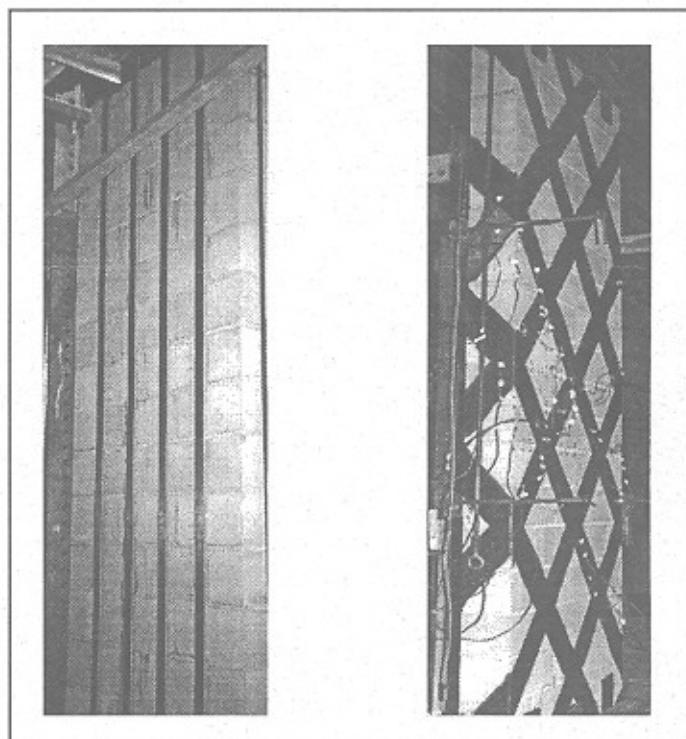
Different Configuration for CFRP Used for Strengthening a Masonry Wall
